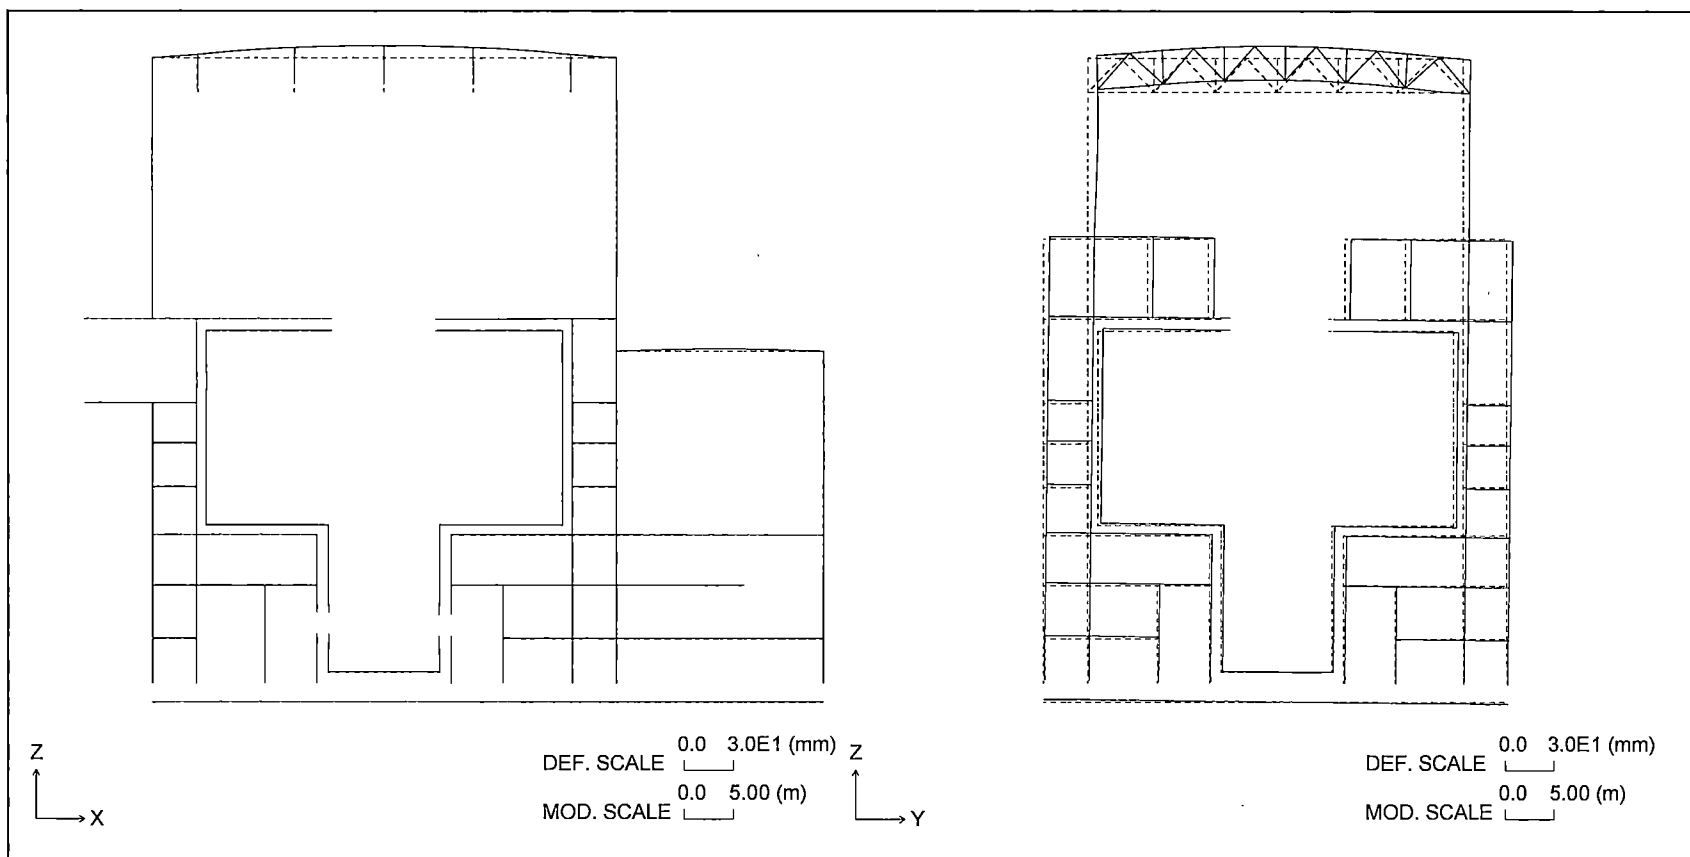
Section Deformation for Wind Load (West Wind)
